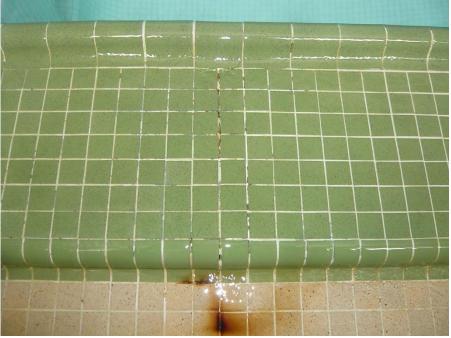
Cracked and deteriorated grout joints in the ceramic tile gutter as observed near the southwest corner of the pool
